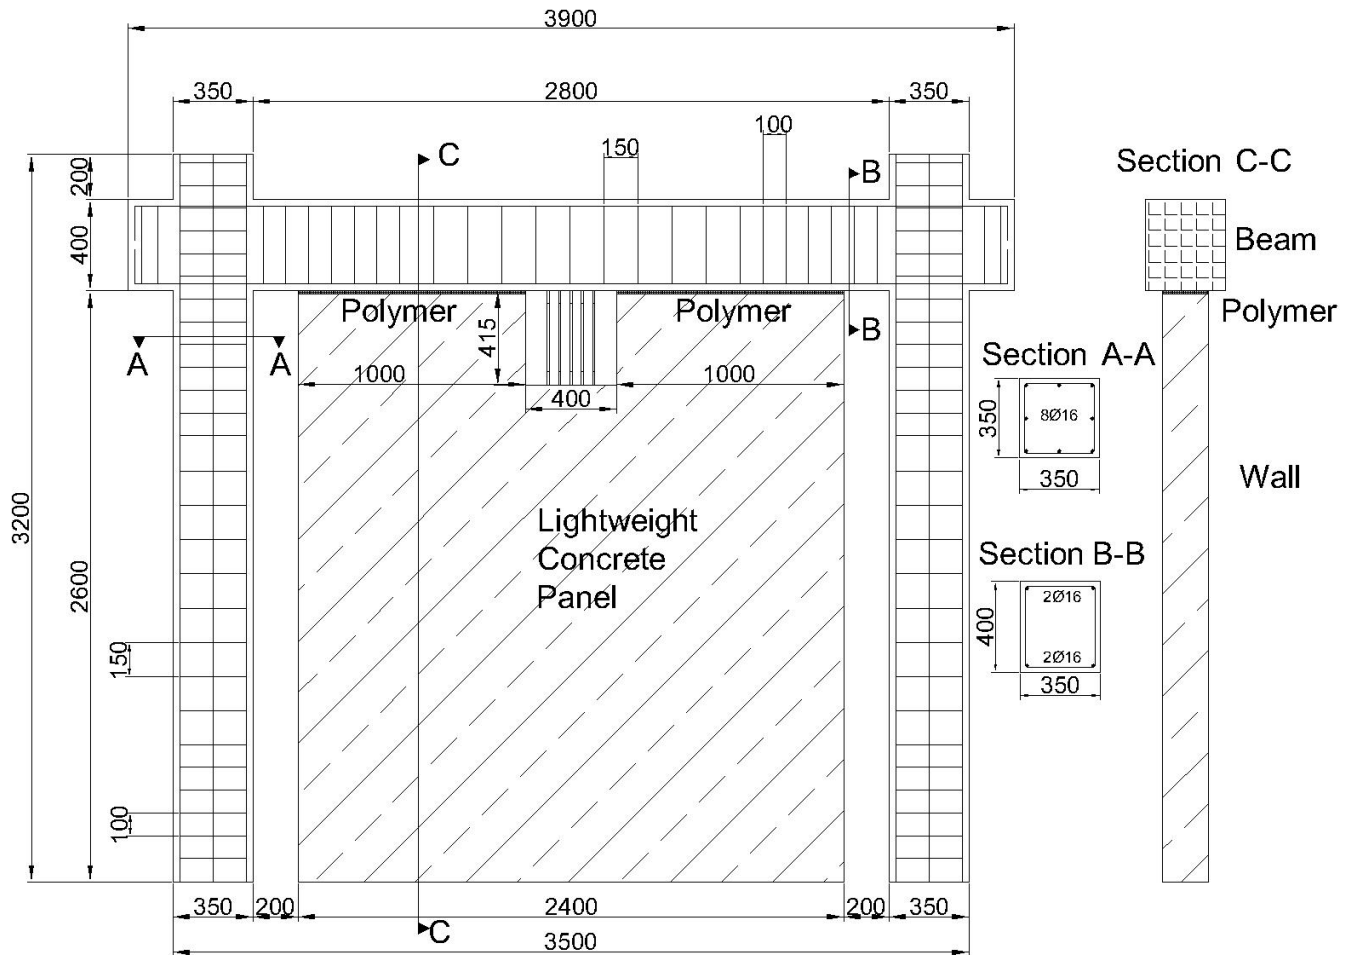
Dimensions of Frame with 2nd Type of Wall and Rebars of RC Frame
